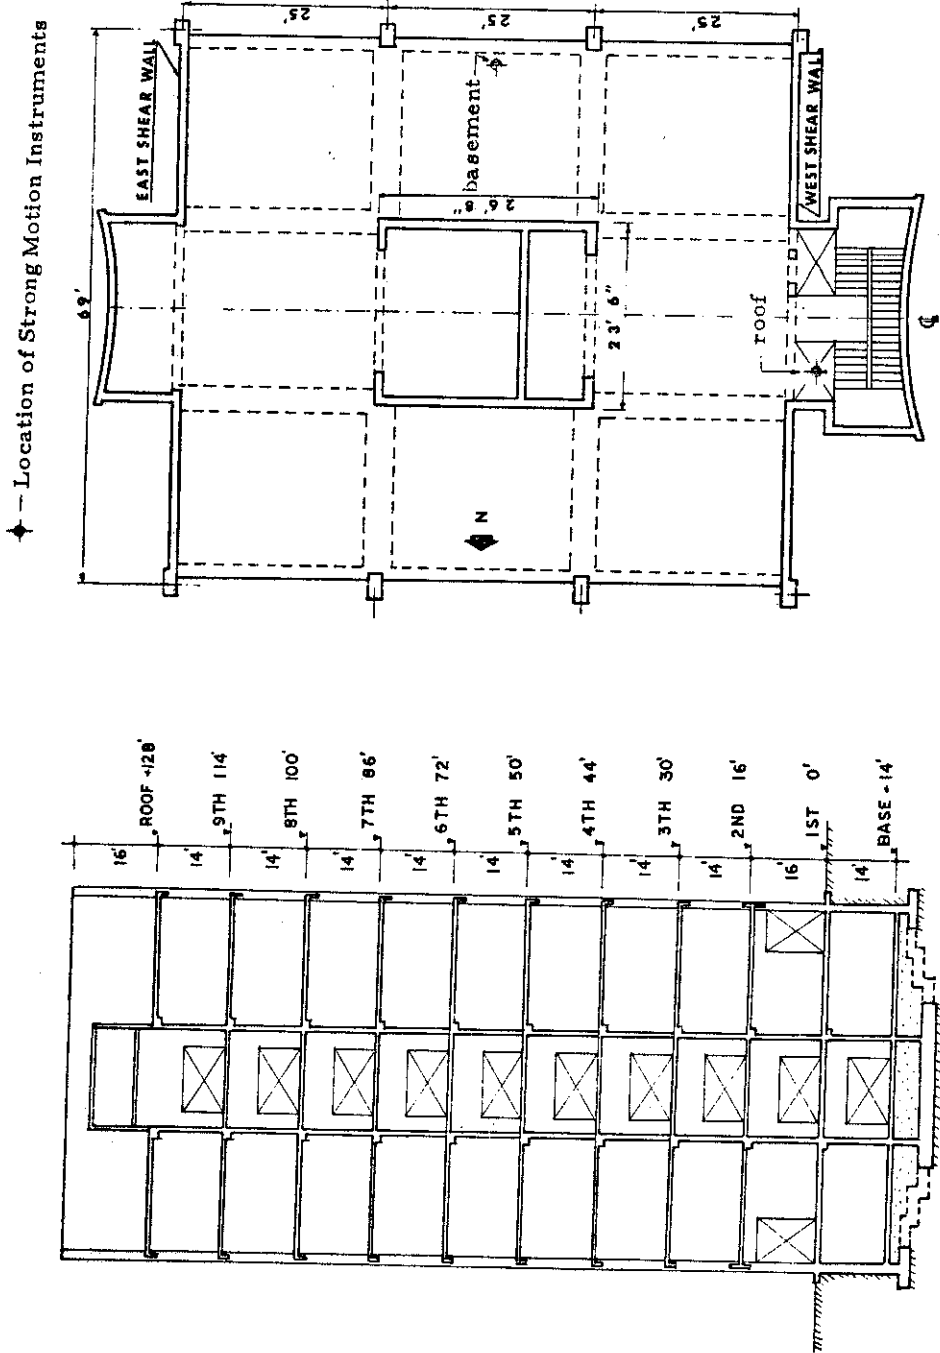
Schematic of the Millikan Library structural system. (a) Transverse section (b) Typical floor plan (from Foutch et al. [4]).
